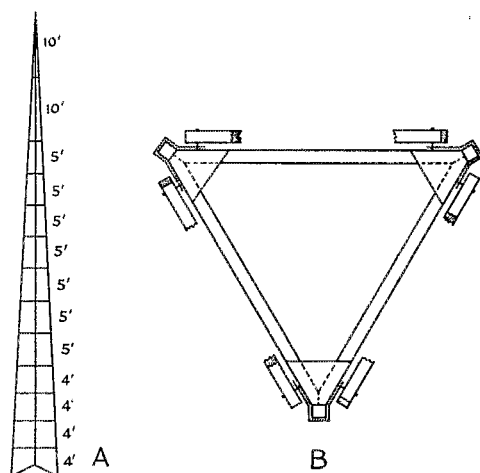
The spacing of the various sections of the mast (A) and a plan view of one section (B), showing how the horizontal members butt into the vertical members.
